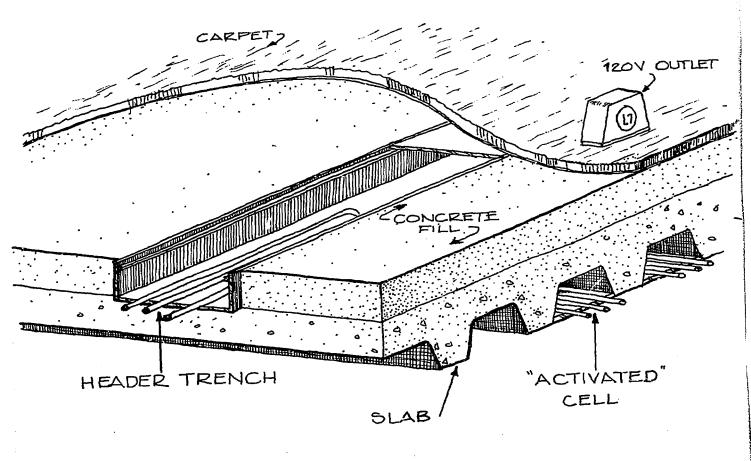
METHODS OF ROUTING WIRING AND CABLING (2): CABLE RAMP AND UNDERFLOOR RACEWAY
